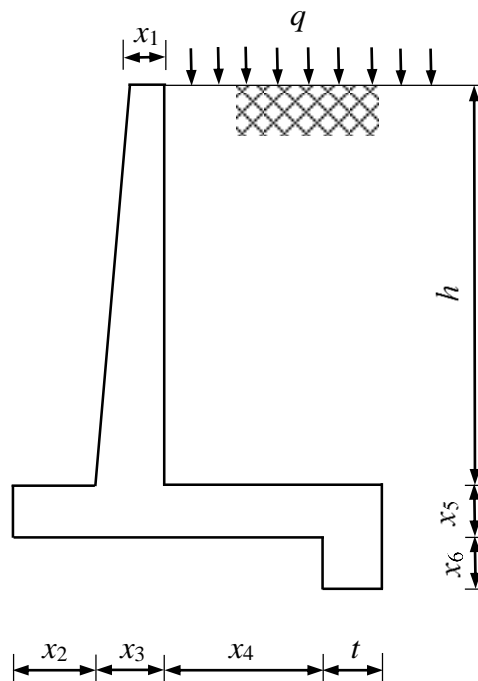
Design variables and parameters of the concrete cantilever retaining wall
